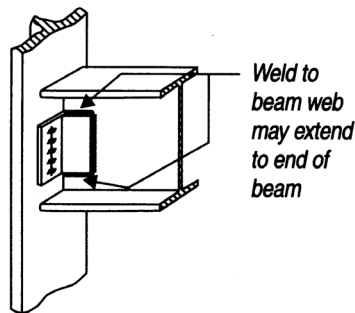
Fillet weld details on framing angles.
